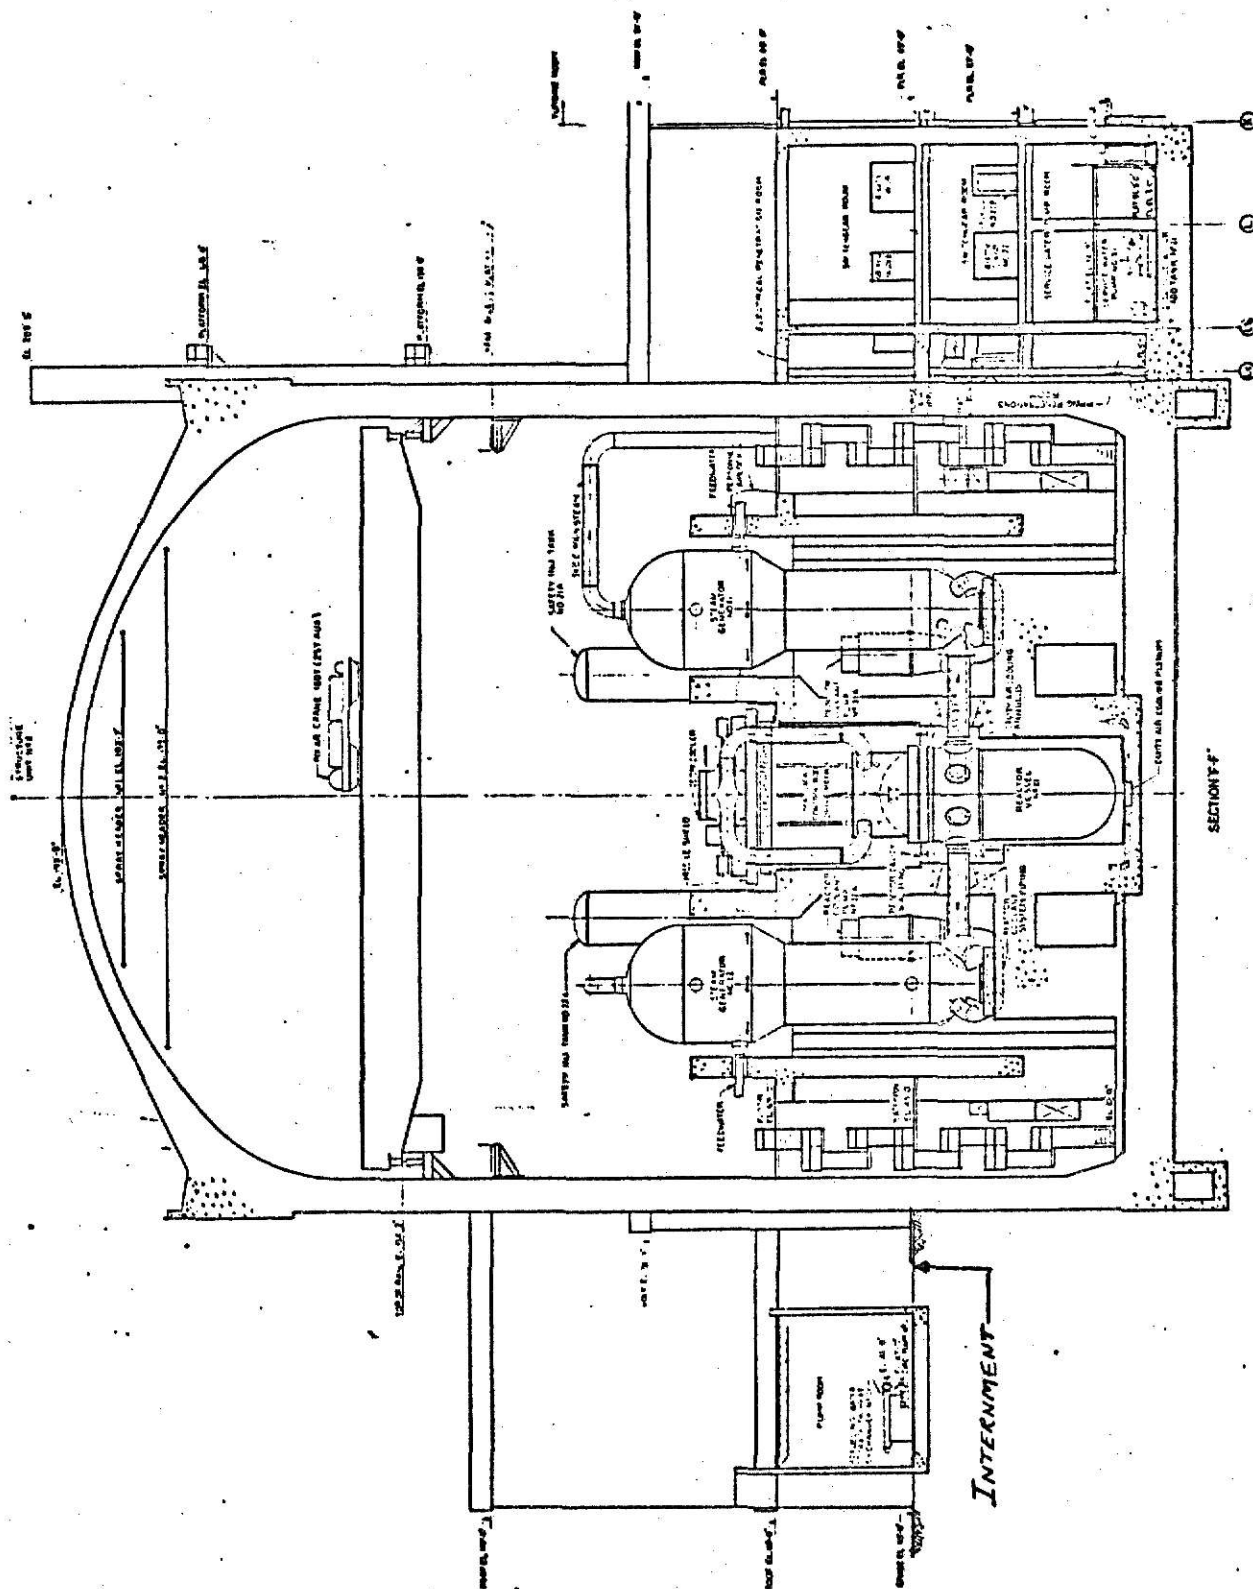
Plan of Calvert Cliffs PWR's Showing Major Building Layout
